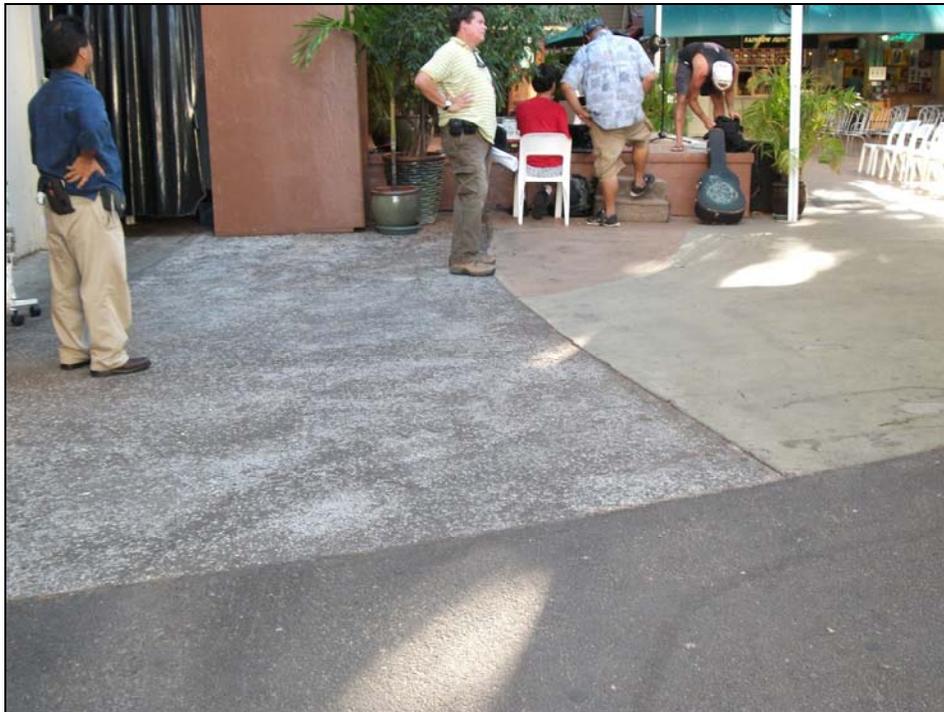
Trench 22, northwest central portion of campus, northeast of stage, view to southwest (*makai*)
